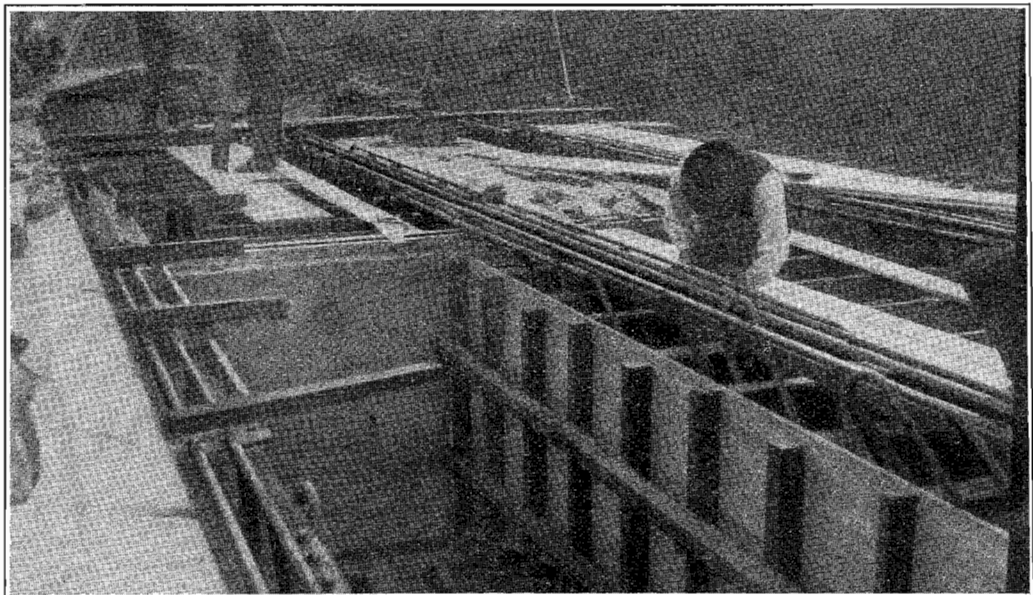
Pyke's Creek bridge. Showing welded trusses supporting framework for concrete.
